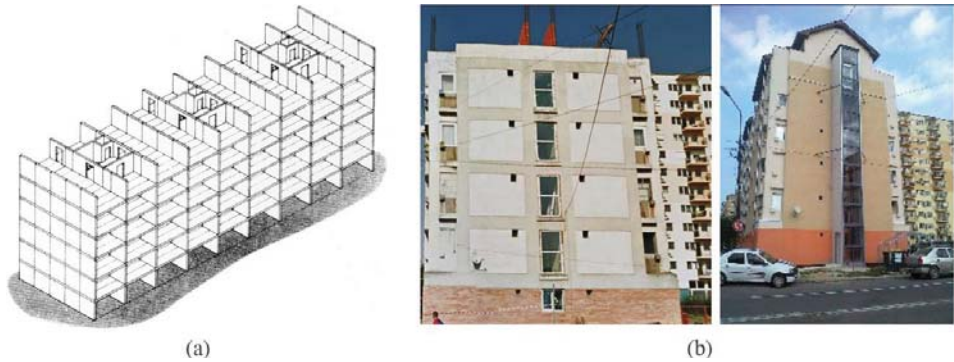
(a) Typical large panel building [3] and (b) example of structural modifications in buildings
